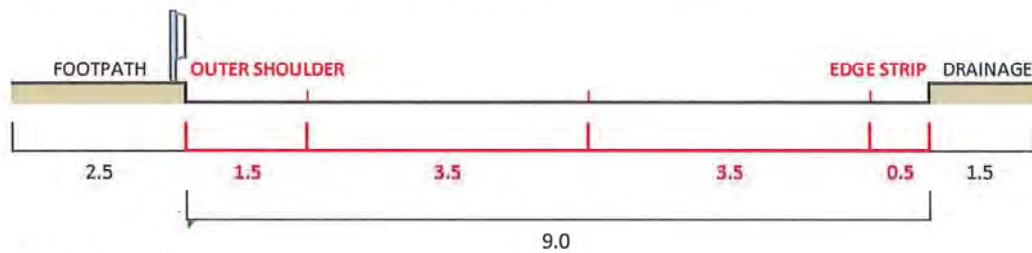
shows the cross section of the service road designed in DPR. Lane configuration of the service road is not shown on the drawing.
